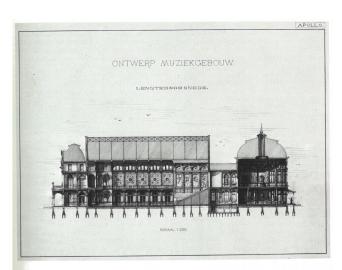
Longitudinal section and side elevation of the first submission of the Apollo design by van Gendt. Source: Lansink (1988).
